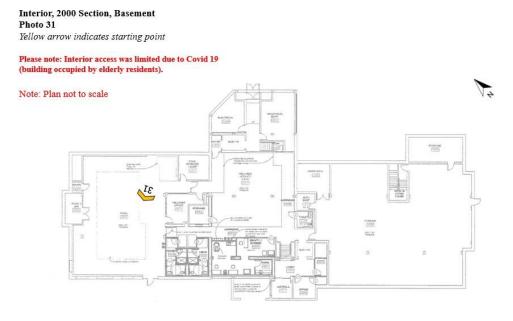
Interior, 2000 Section, Basement Photo Key (Photo 31)
